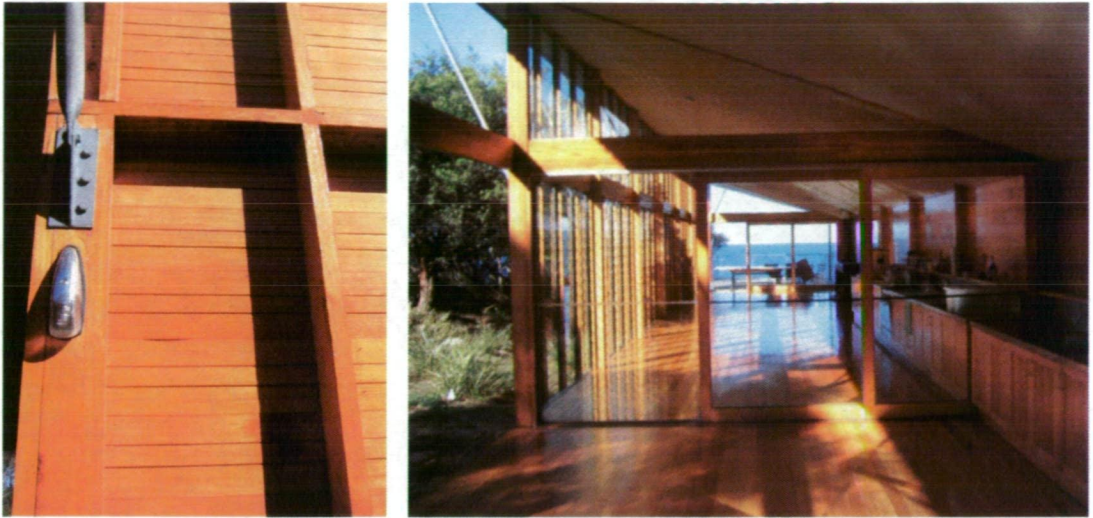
& 7.22 – Bay of Fires Lodge, minimal material palette and timber construction and detailing
